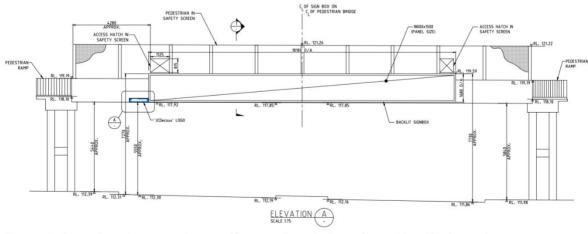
Sign elevation – south-west (Source: Dennis Bunt Consulting Engineers)
